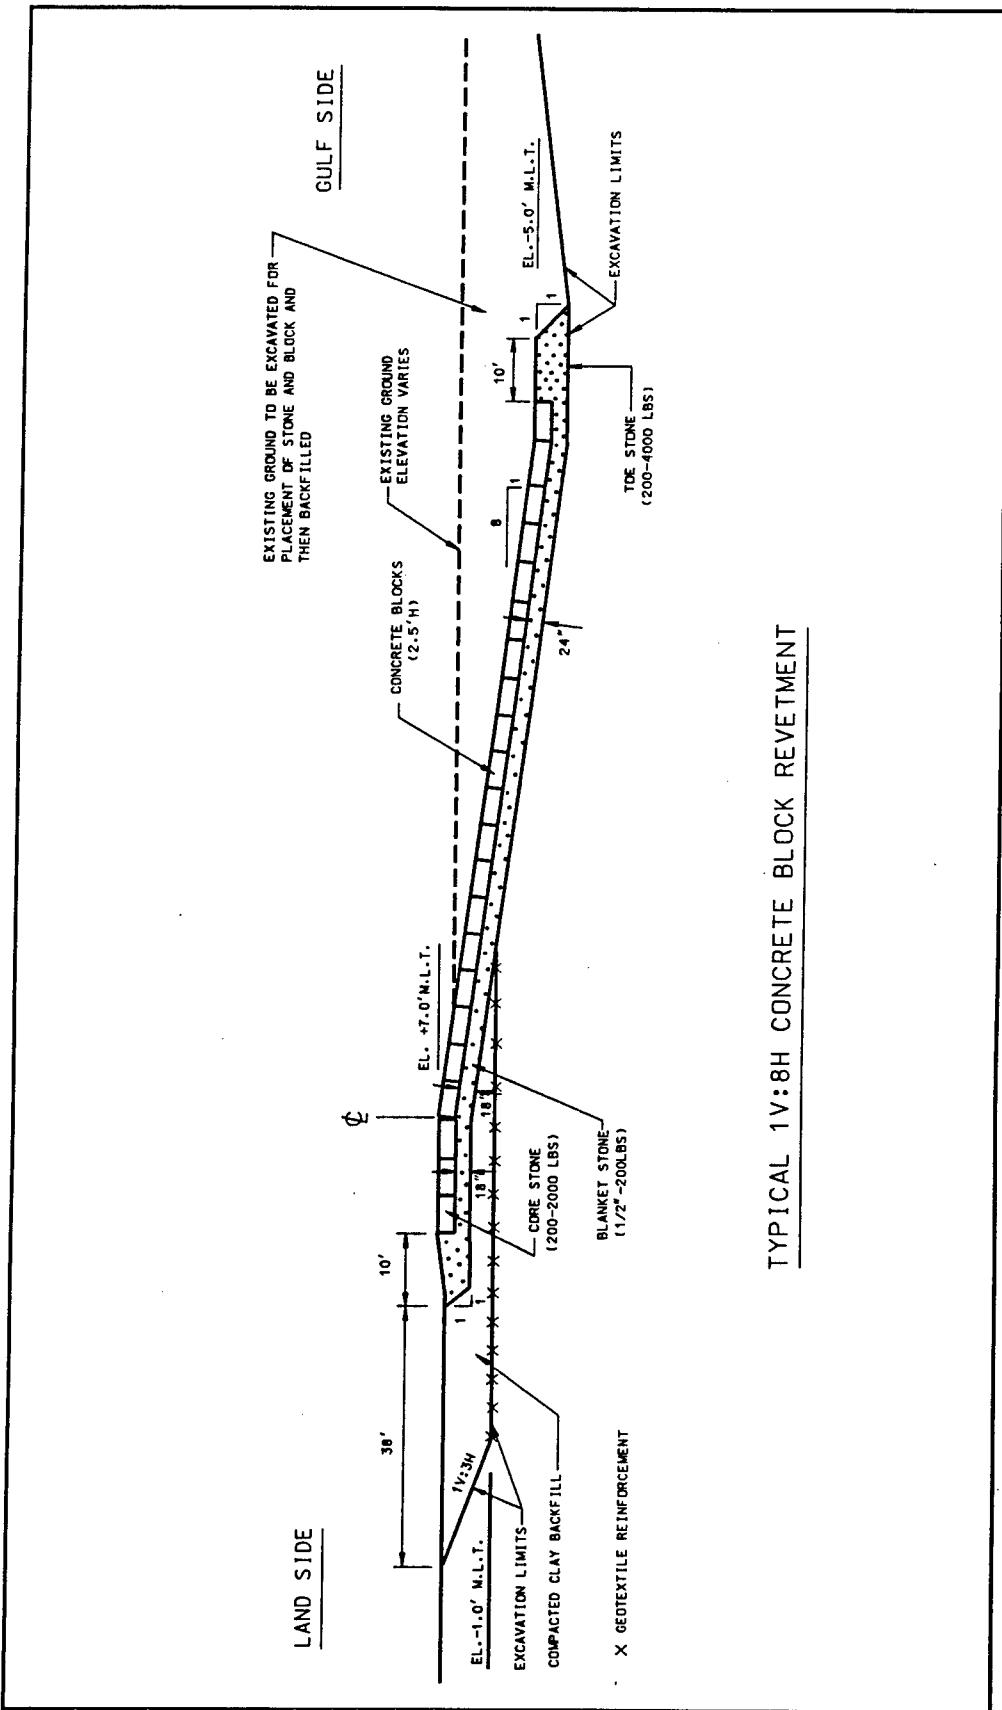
Cross-section of revetment with 1H:8V reinforced slope
